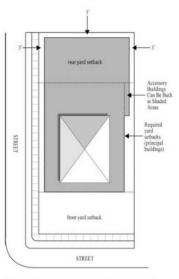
Accessory Building Placement for Corner Lots. Accessory buildings may be located in shaded areas.
